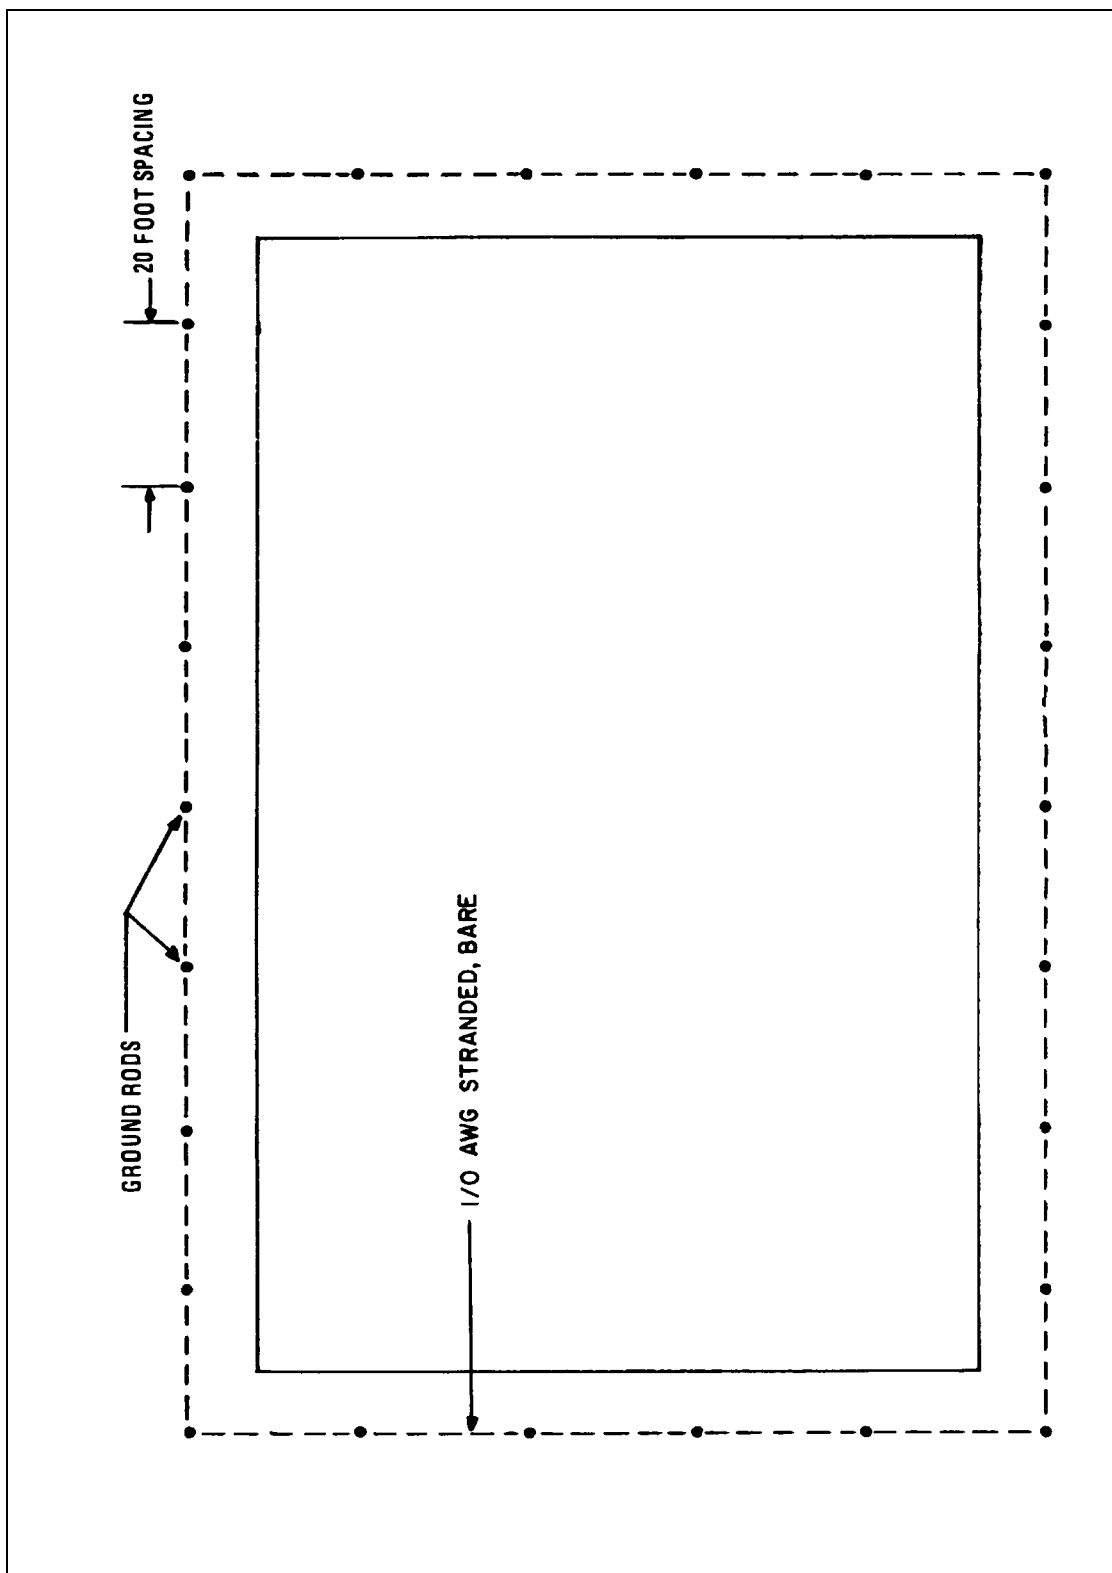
Earth electrode subsystem configuration for rectangular shaped facility
